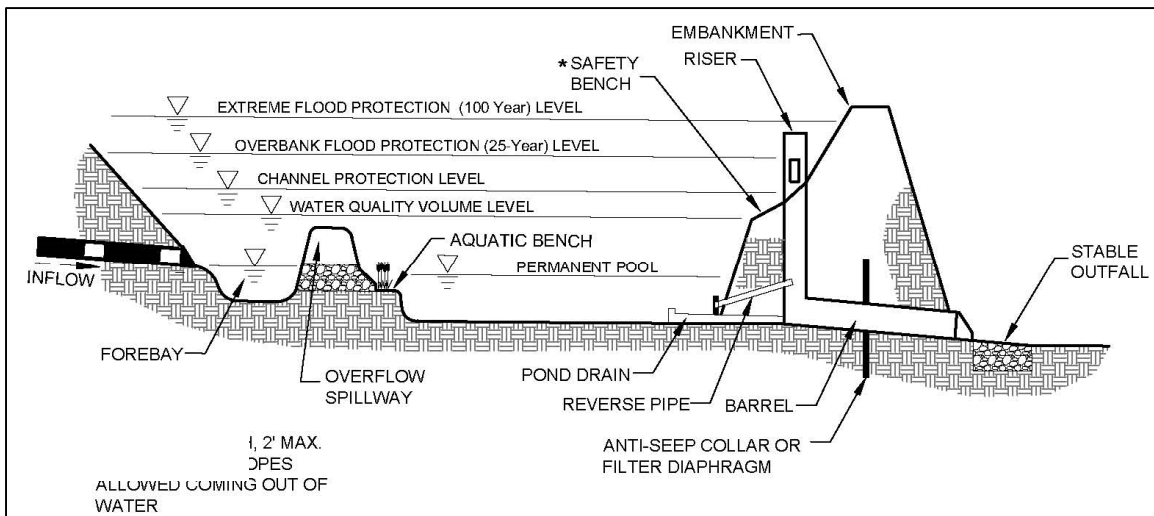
Sizing criteria water surface elevations in a stormwater pond.
